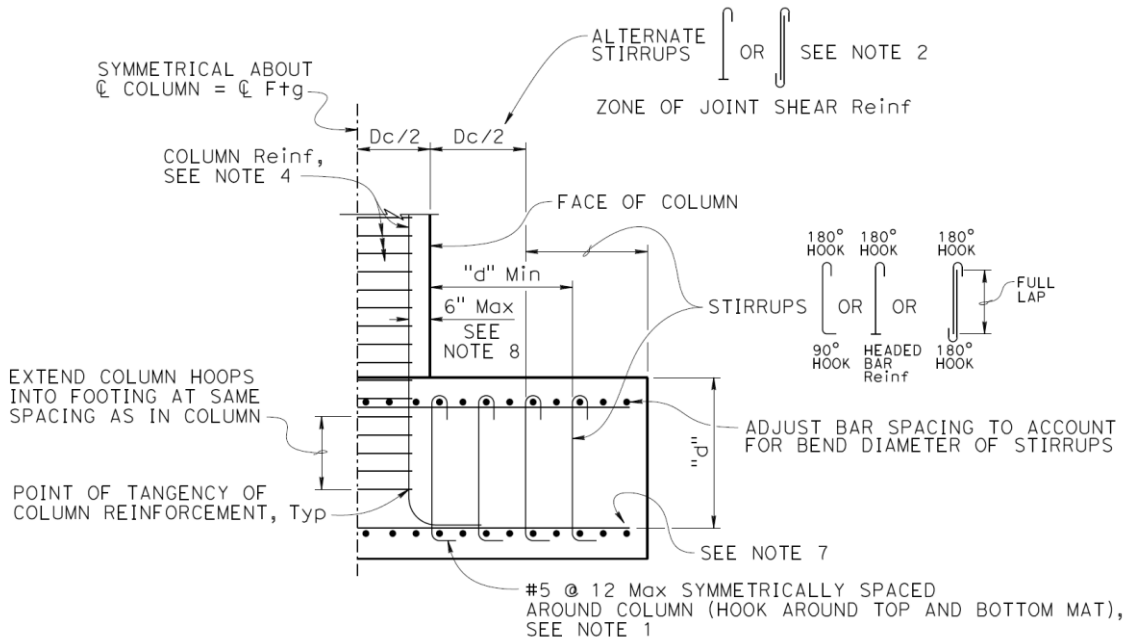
Footing Reinforcement Fixed Column (see also *Seismic Design Criteria* Figure C6.2.2.5-2)
